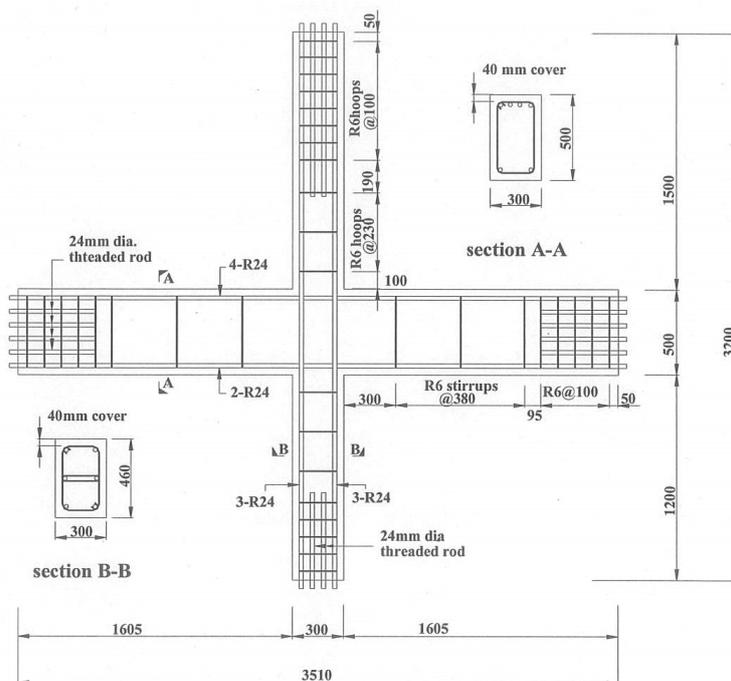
Reinforcing details of As-built test Unit 1 [6]
